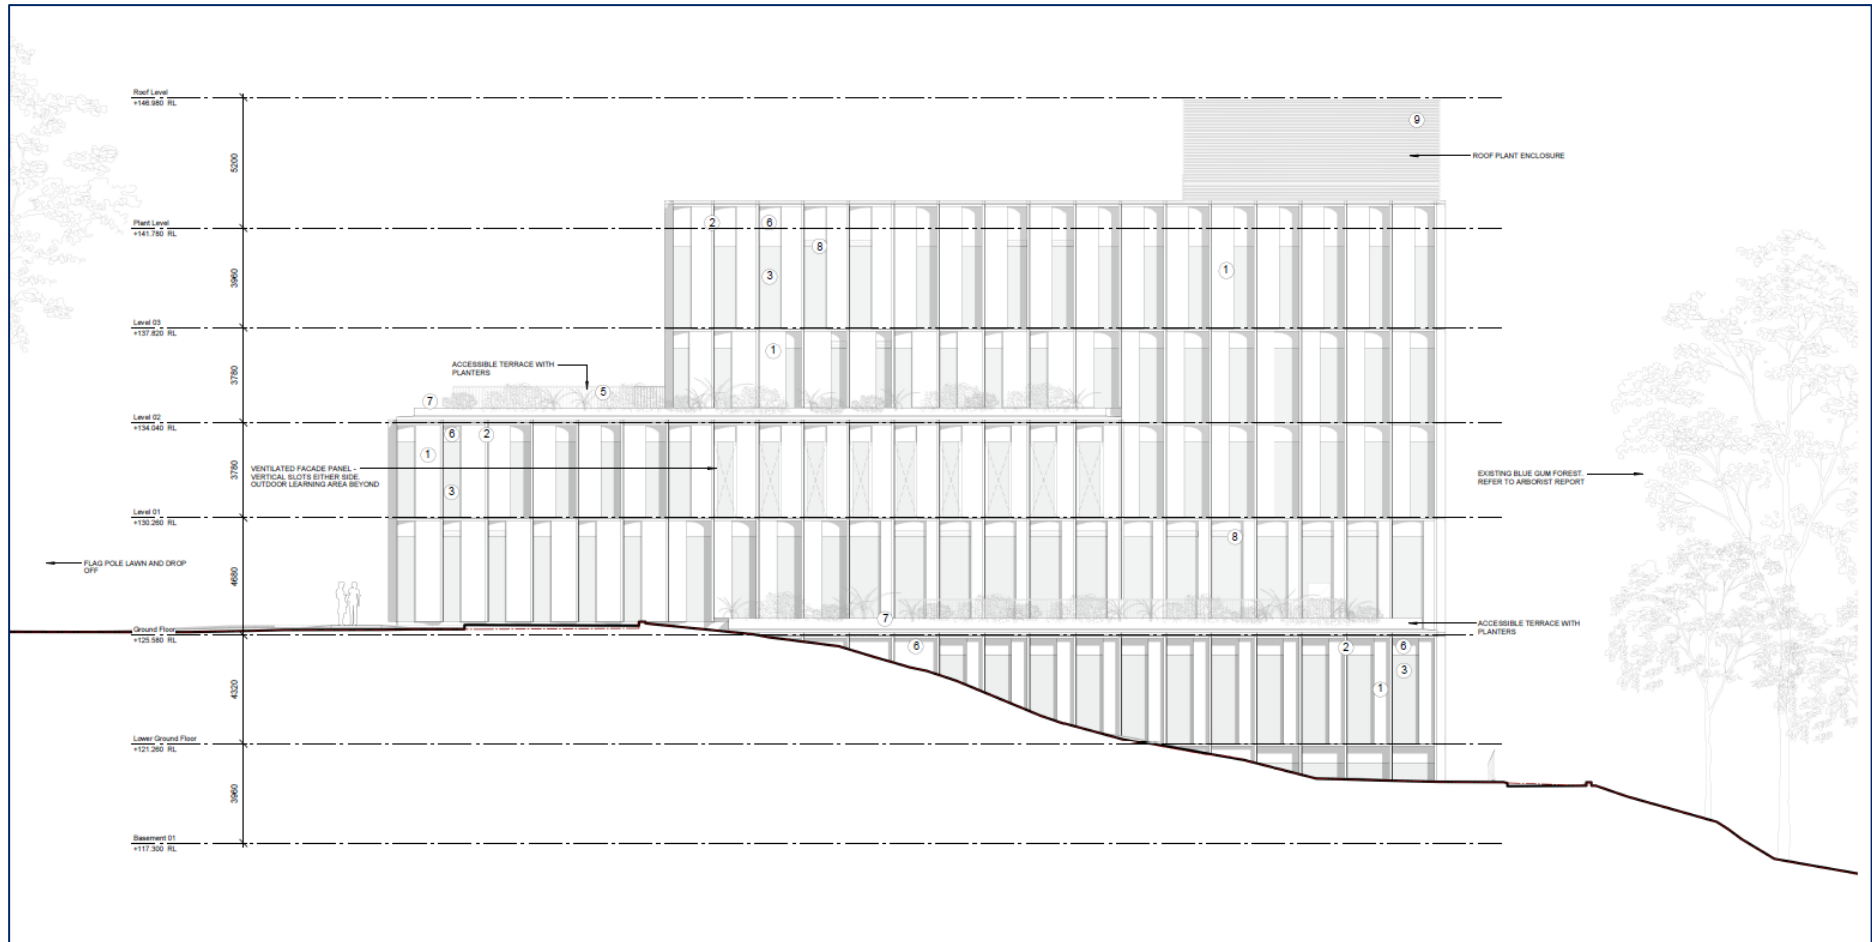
| East elevation (Source: Applicant's EIS 2025)
